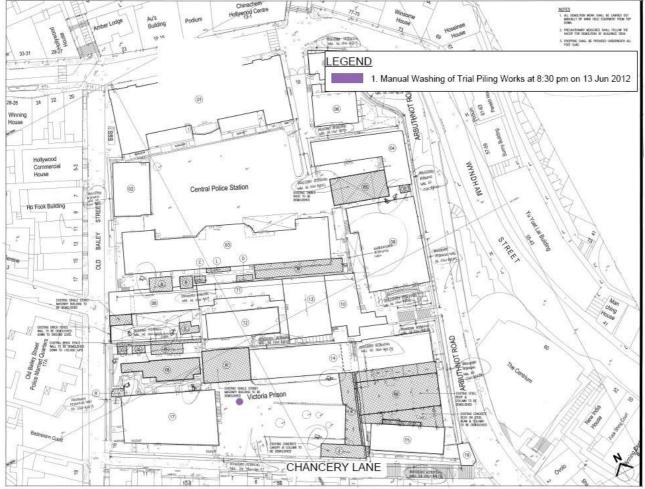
Site layout plan marking for Enquiry & Complaint log (CPS/E&C/06)
